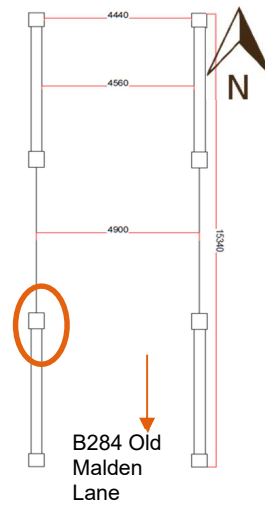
Longitudinal displacement of parapet on the western face, south of the bridge
